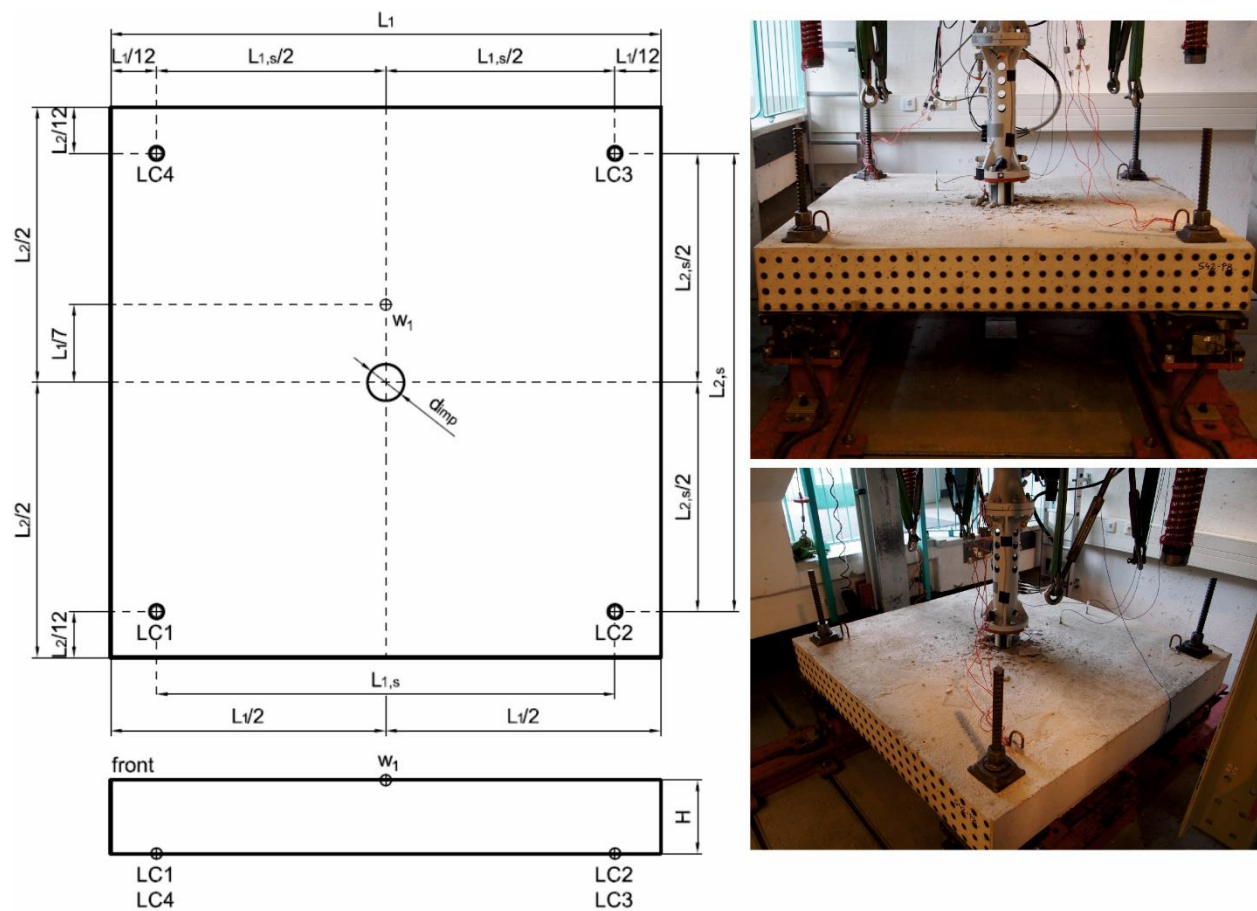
Parametric specimen dimensions and measuring plan (left) and view of the experimental setup (right), drawing: M. Hering; photos: F. Bracklow
